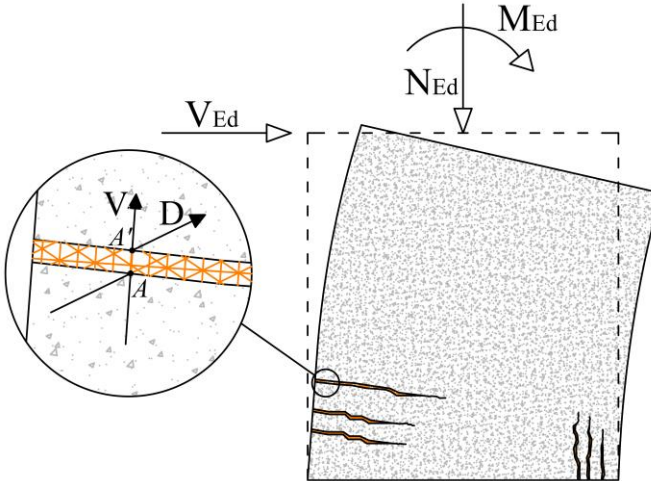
Bending failure of a masonry pier strengthened with EQ-GRID
